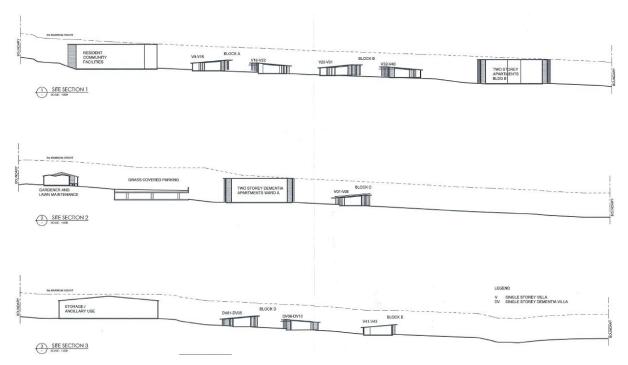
Indicative section plan of scheme (source: Phil O'Donnell Architects).
